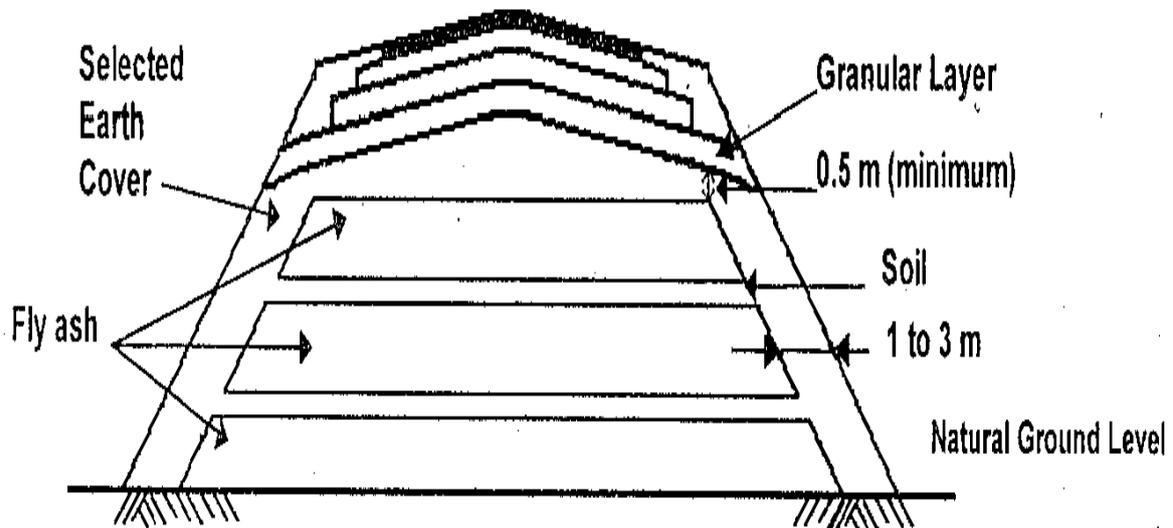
Typical Cross-Section of Embankment with Alternate Layer of Fly Ash and Soil
